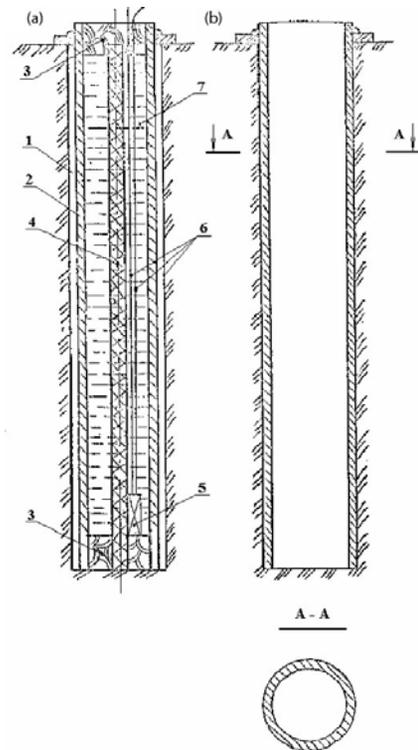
Structure of a shell tube (a) and tubular rock bolt TA1 (b): 1 - blasthole; 2 - shell tube; 3 - clay cap; 4 - detonating cord DCA or DCB; 5 - electrical detonator; 6 - electrical wires; 7 - filling compound (sand, water).
